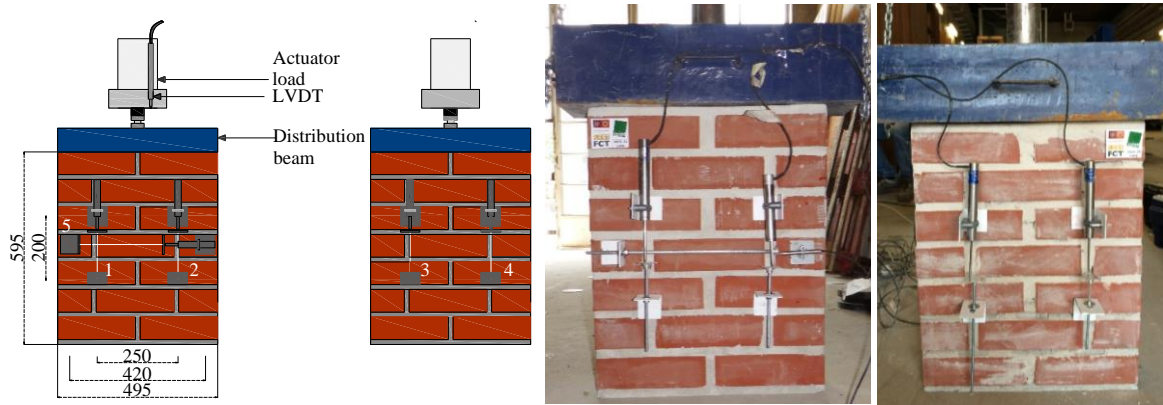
Instrumentation for compression test on masonry assemblages
